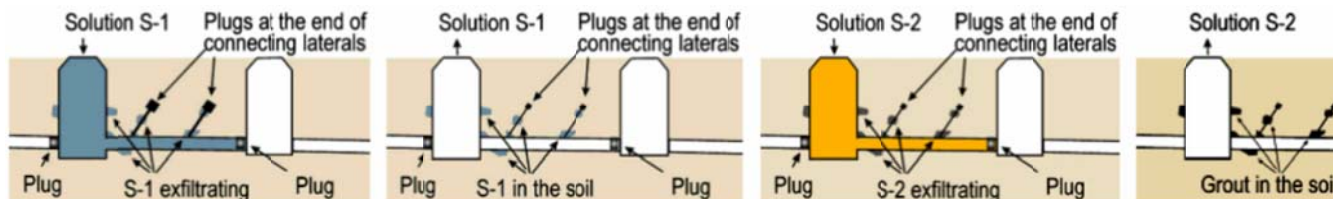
Flood Grouting Process. (Sterling, 2006)
